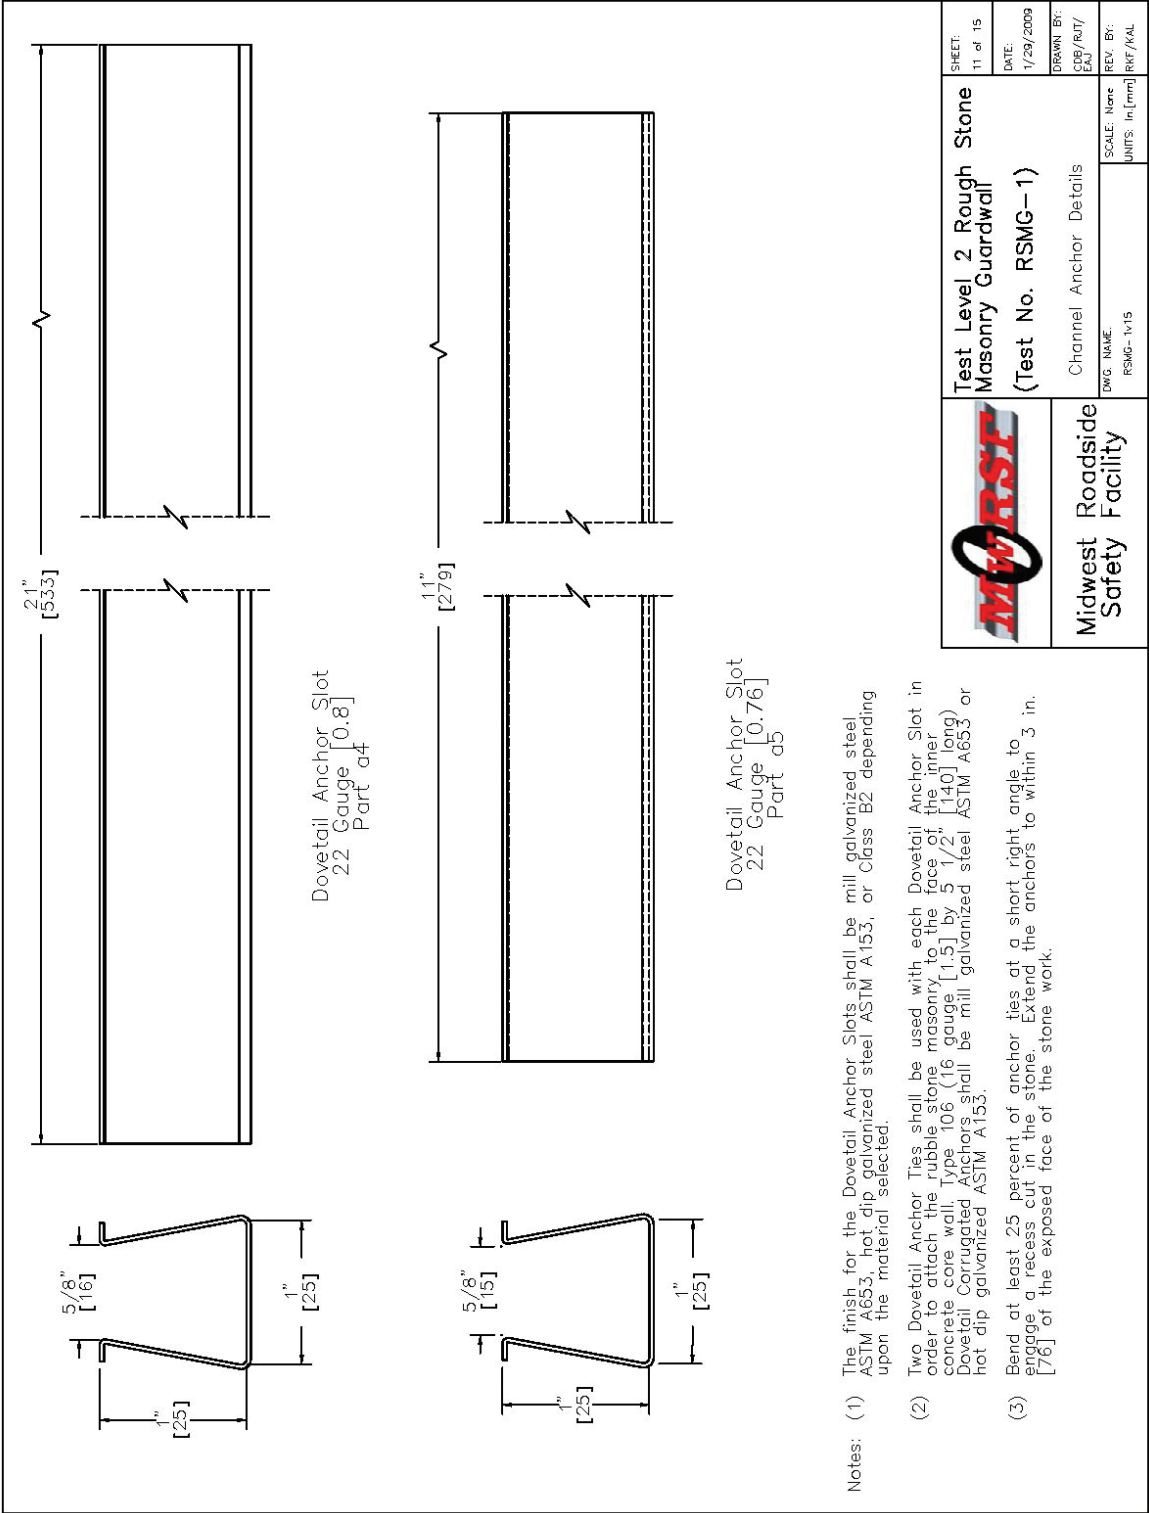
Dovetail Anchor Details, Test No. RSMG-1
